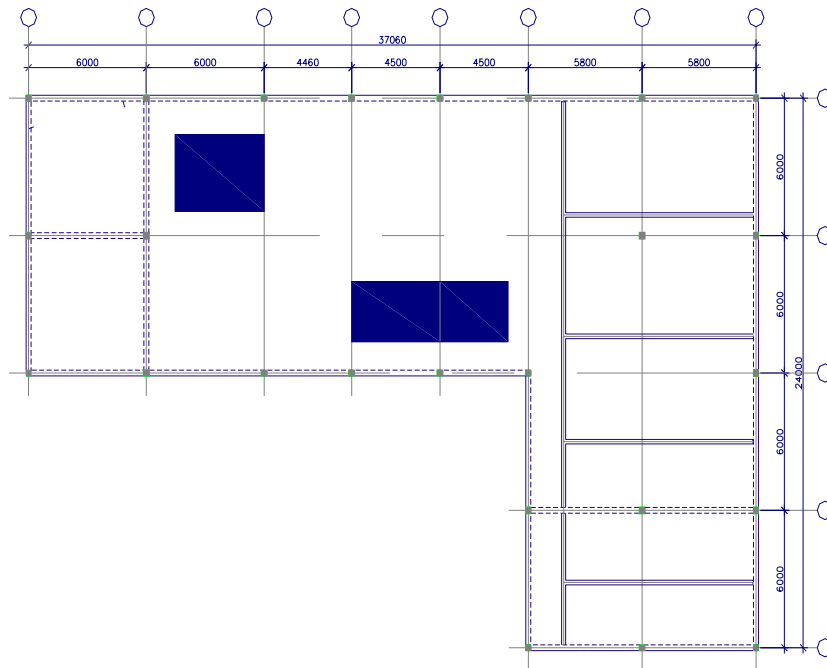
Typical application machinery loads on suspended slab of industrial building
